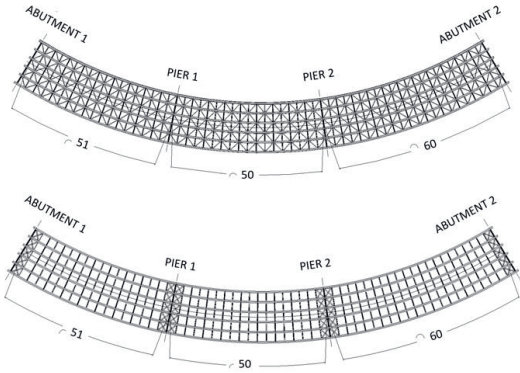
Top: Arrangement of the top lateral bracings. Bottom: Arrangement of the bottom lateral bracing.
